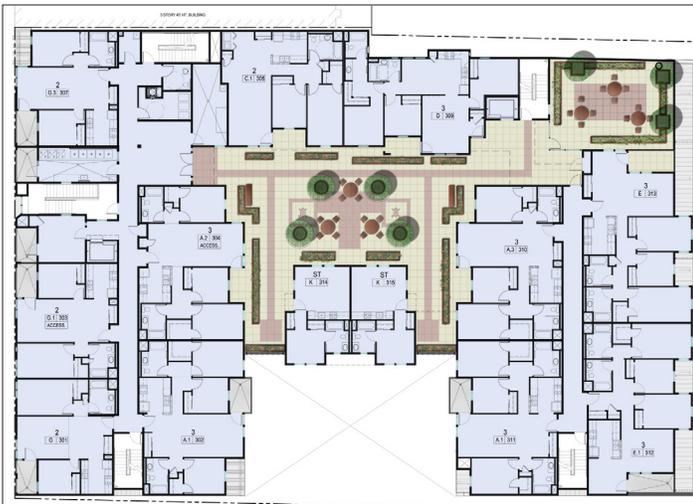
Third Floor Plan. Image courtesy of Pyatok Architects.
